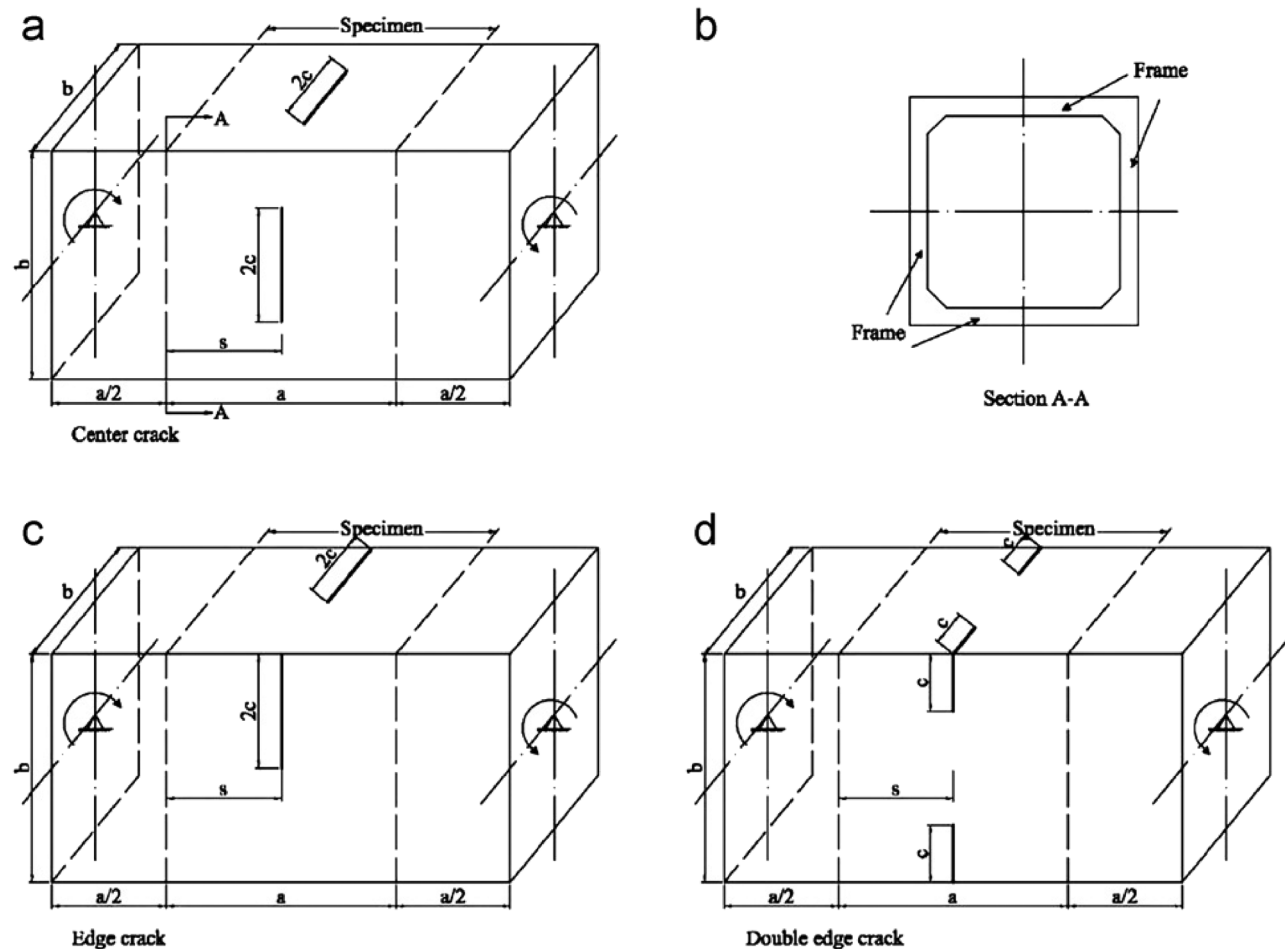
Crack type configuration; (a) Center crack, (b) Section A-A, (c) Edge crack, and (d) Double edge crack [101].
